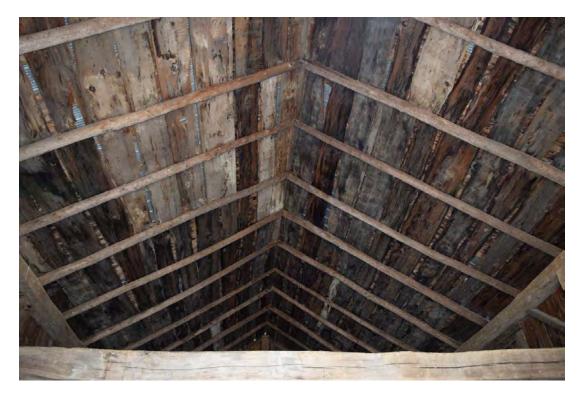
ROOF STRUCTURE OF SMALLER TIMBER FRAME STRUCTURE, NOTE RAFTERS ARE IN THE ROUND AND THERE IS NO RIDGE BEAM, TYPICAL OF EARLY CONSTRUCTION PRACTICES
